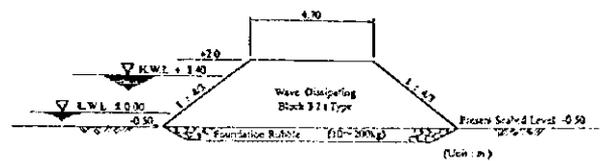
Typical Cross Section of Training Wall (Rubble Mound with Dissipating Concrete Block)
